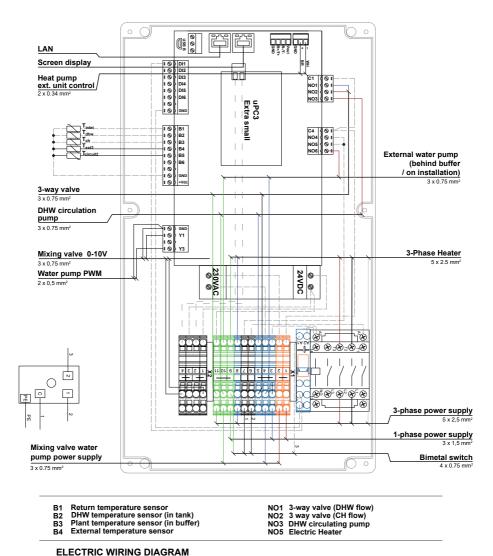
Electrical and installation diagram of wiring connections of the heat pump power and control system.
